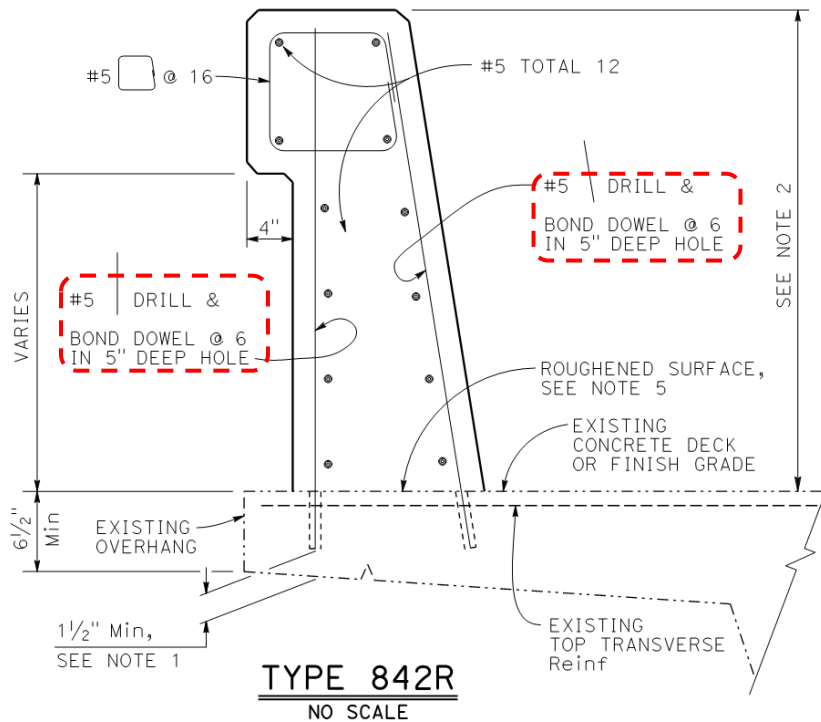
Hawaii DOT concrete rail retrofit with adhesive anchors, MASH TL-3 rating.
